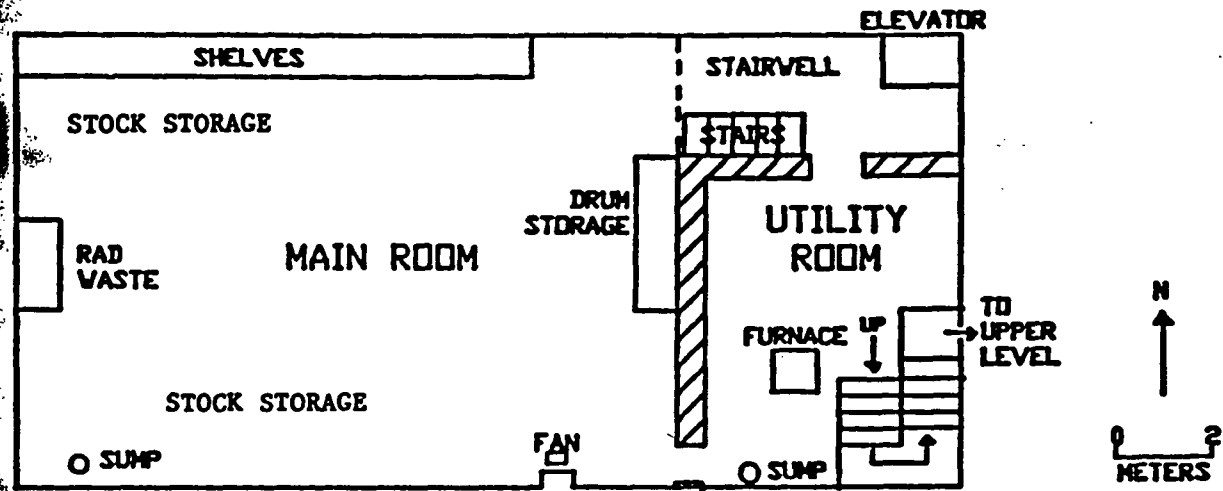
Floor Plan of the Sunflame Appliances Facility Subbasement.
